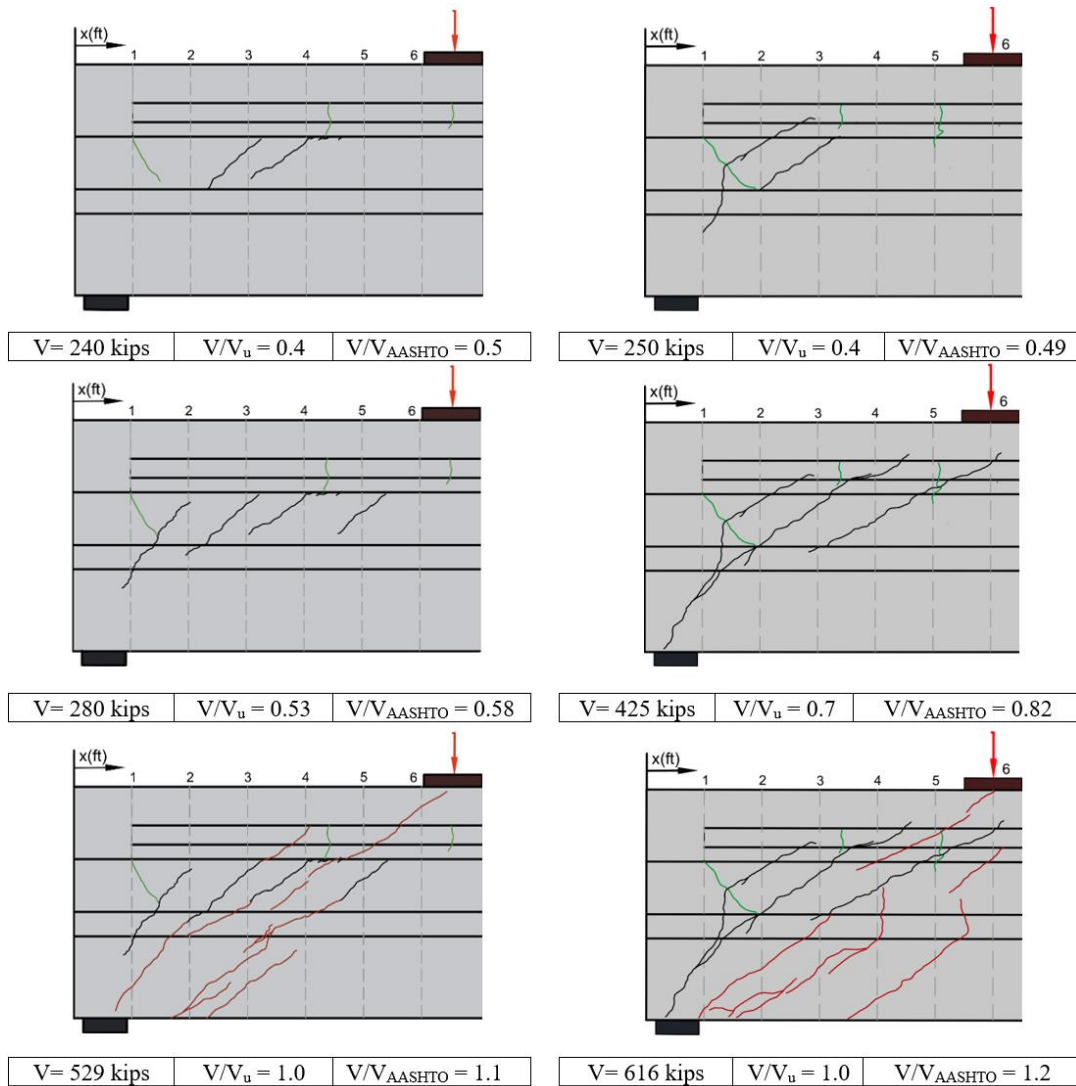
Crack progression maps of B2-60-6-D-2 (left) and B4-100-10-D-2 (right)
